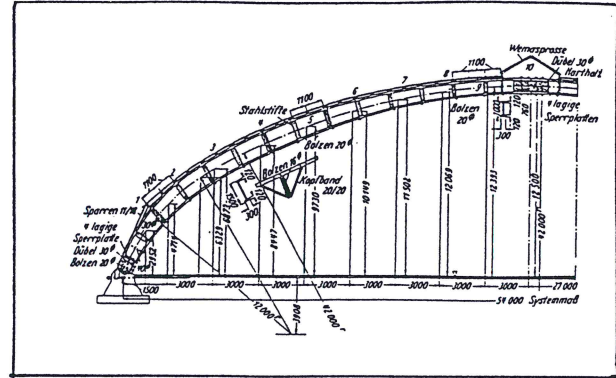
Railstation hall in glued laminated timber with a span of 70 m
